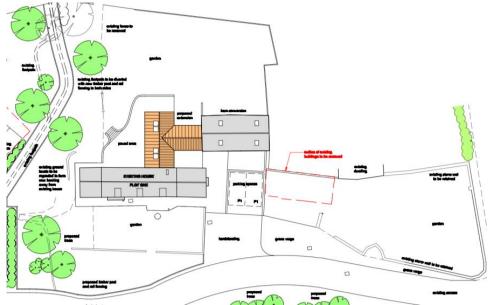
Approved Site Plan under 17/01330/FUL (amended by 20/00536/FUL)
